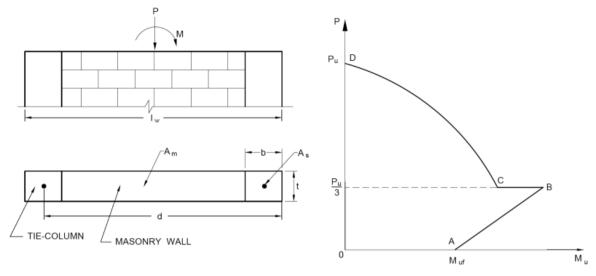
SIMPLIFIED INTERACTION DIAGRAM FOR DESIGN OF CONFINED MASONRY WALLS
